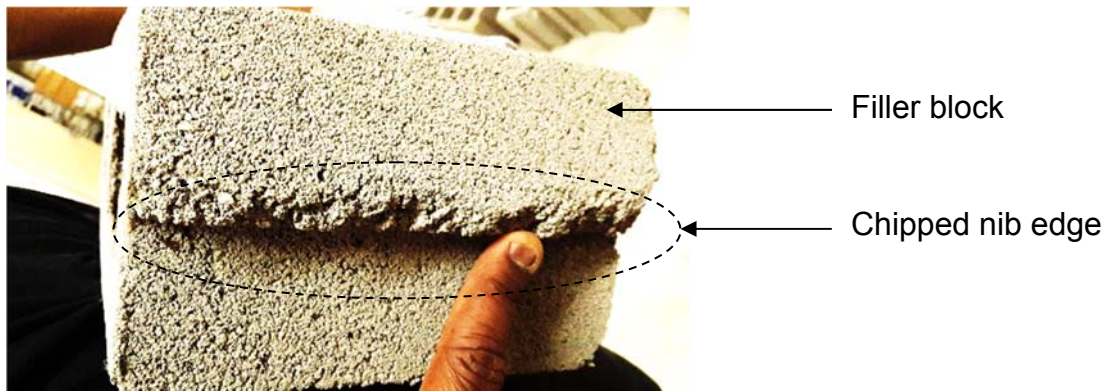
Typical picture of a filler block with a chipped nib edge
